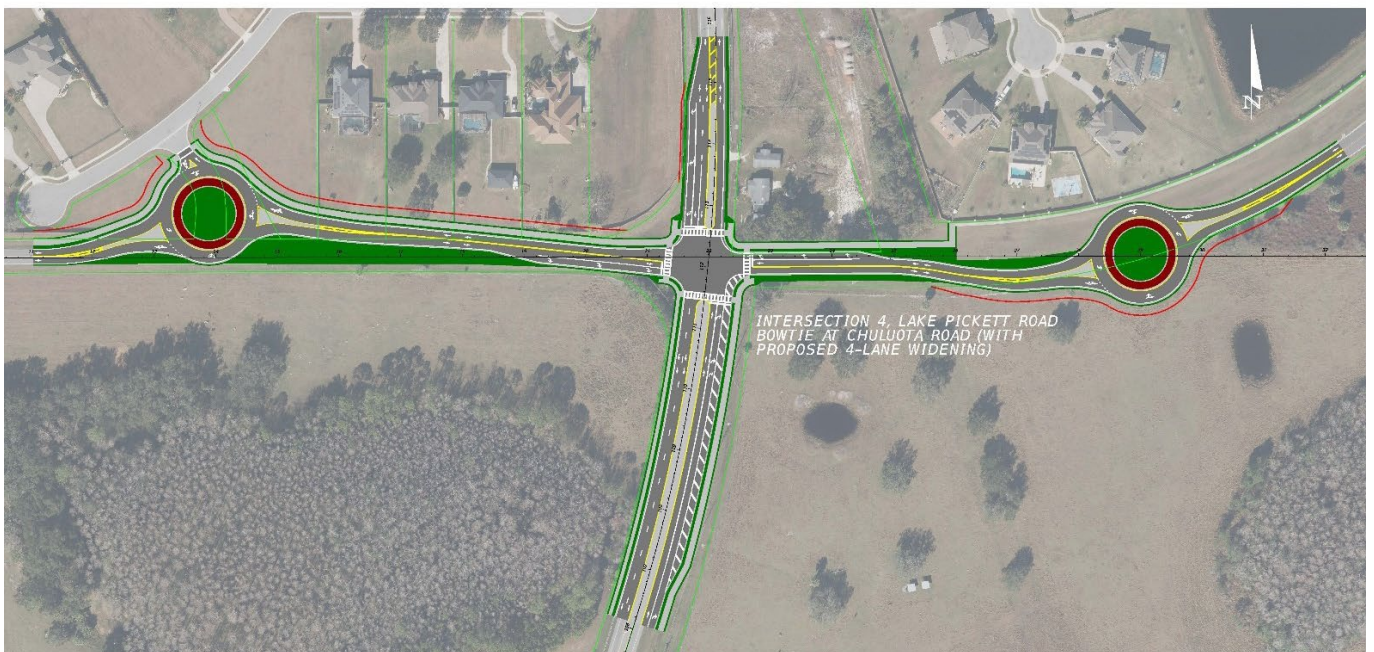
4 Bow Tie Control Option at Lake Pickett Road Under Build Conditions (Four-Lane Widening Section on Chuluota Road)
